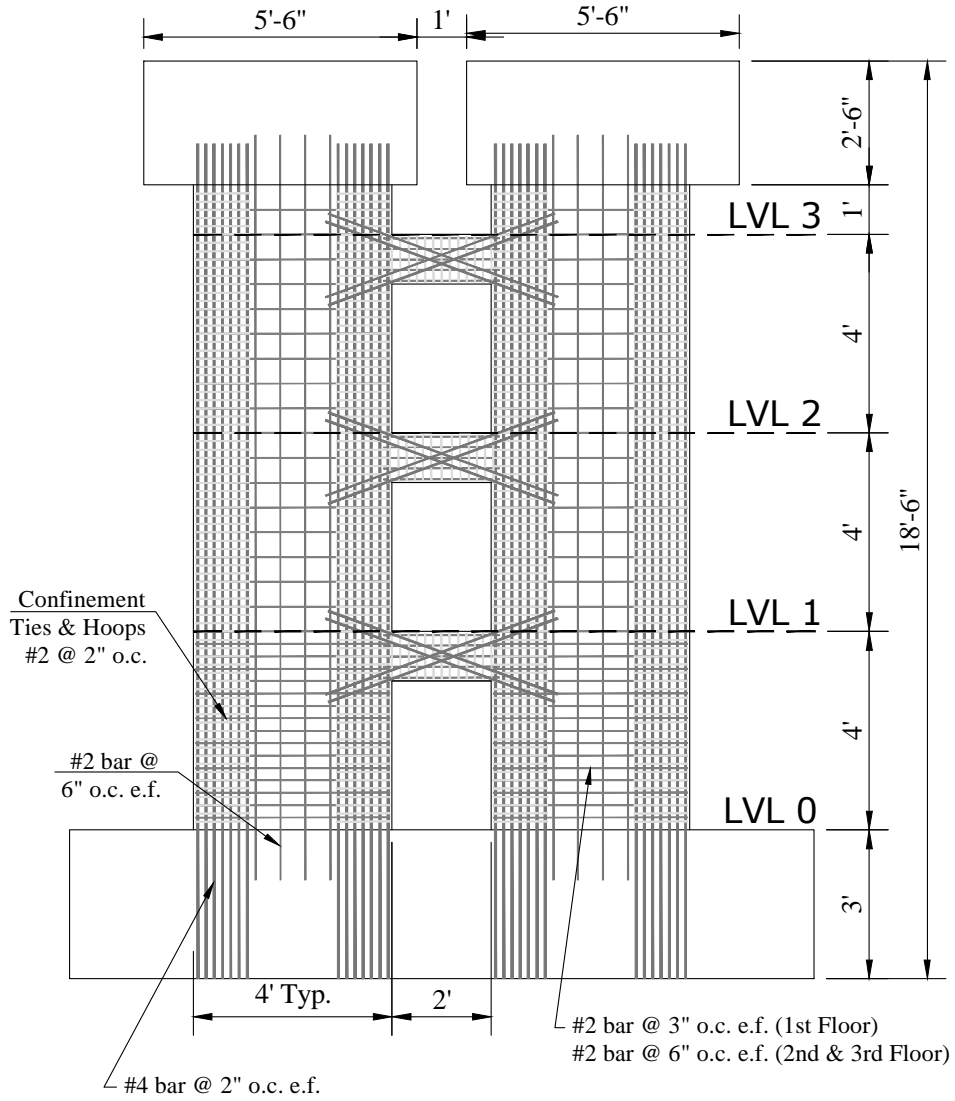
Elevation of coupled wall test specimen (Turgeon 2011)
